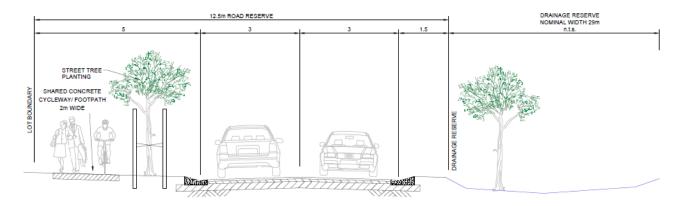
Drainage Reserve Streets Cross Section - Minimum widths
